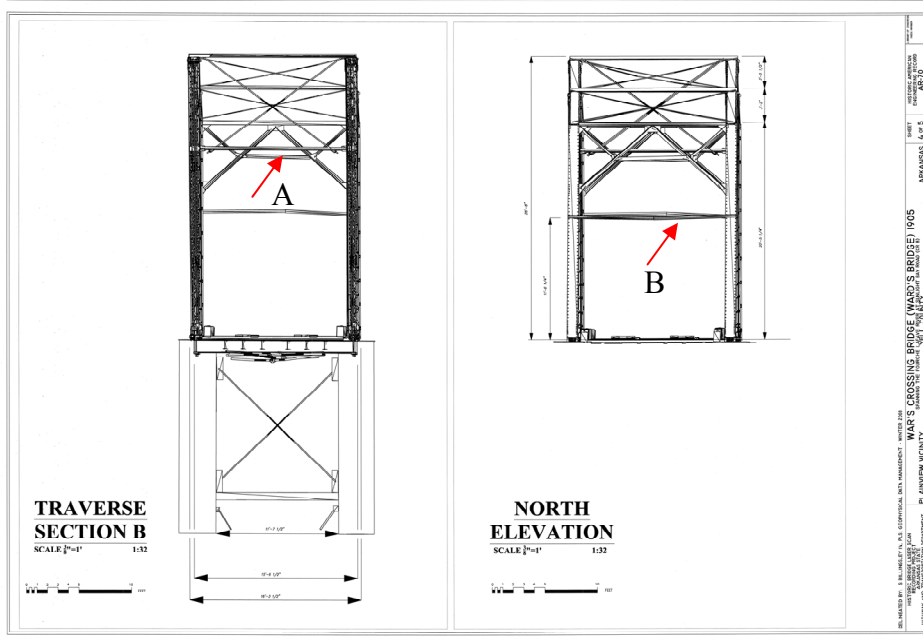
Transverse Section drawings created from the Ward’s Crossing Bridge point cloud.
